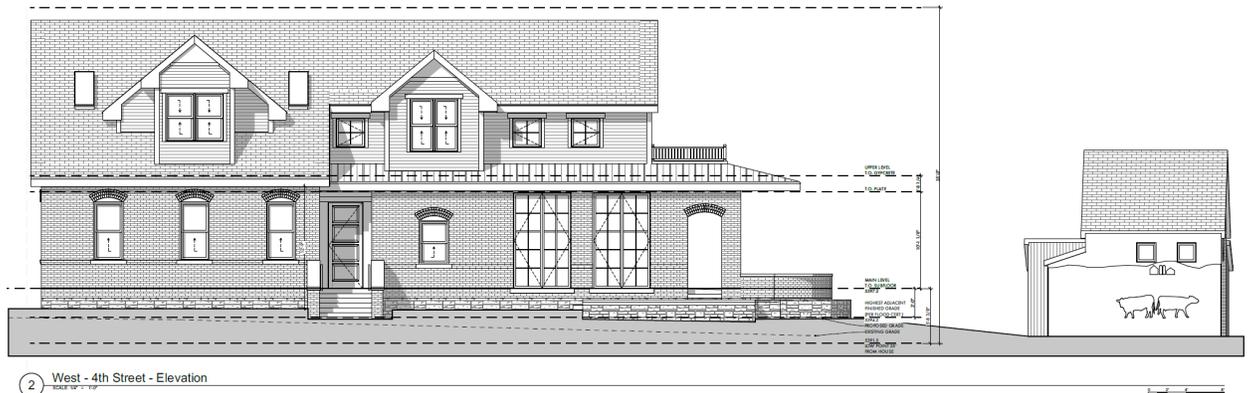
Proposed West (4<sup>th</sup> Street) Elevation.
